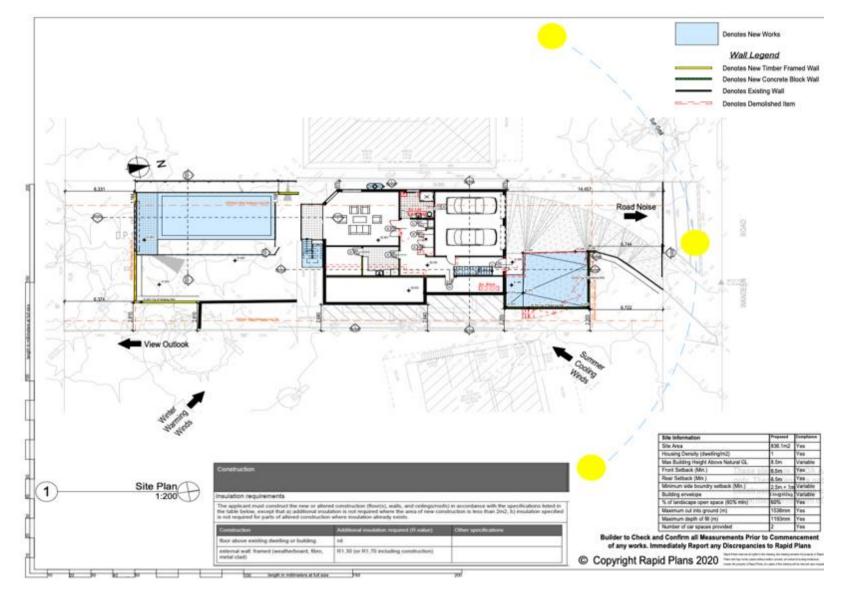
Site Plan. Source: Rapid Plans Building Design and Architectural Drafting, 10/02/20.
